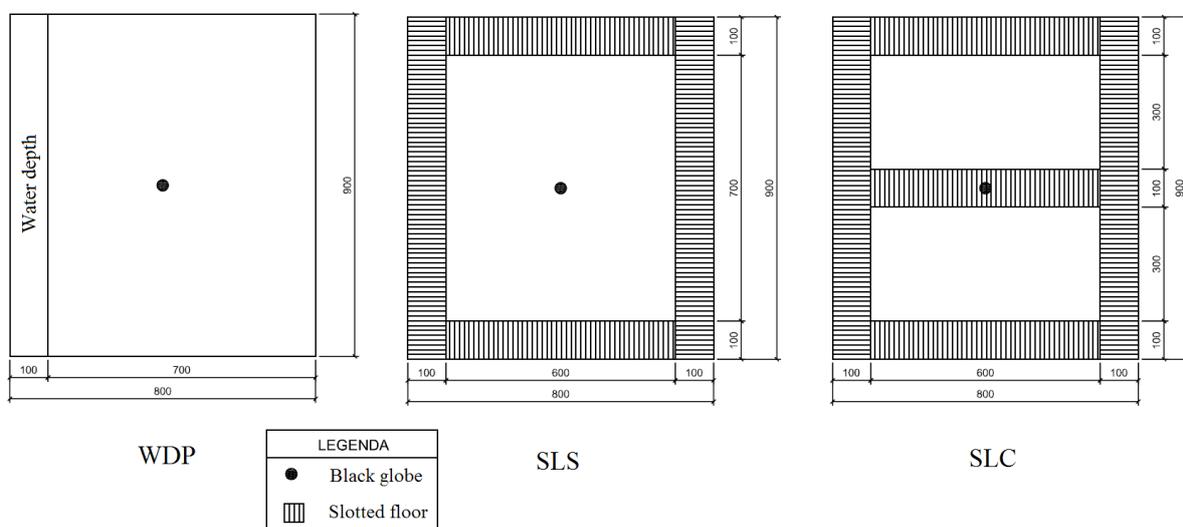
Floor plan of the pens (WDP: Water depth, SLS: slotted floor on the sides and SLC: slotted floor in the center and sides)
